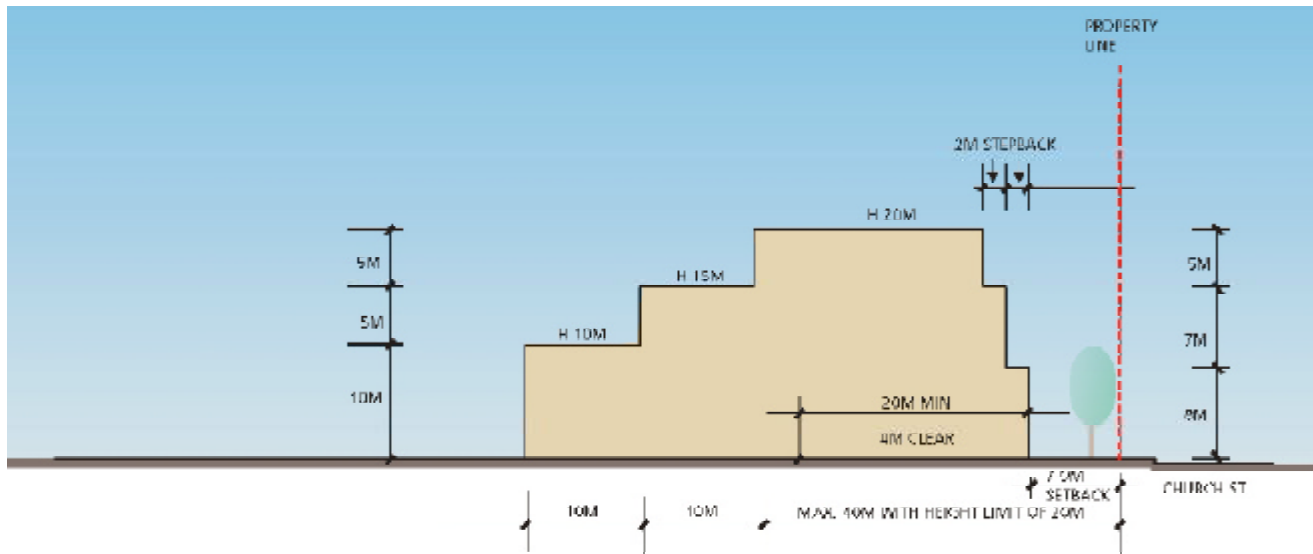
Section along Church Street Showing Height & Setback Zones, N.T.S.
